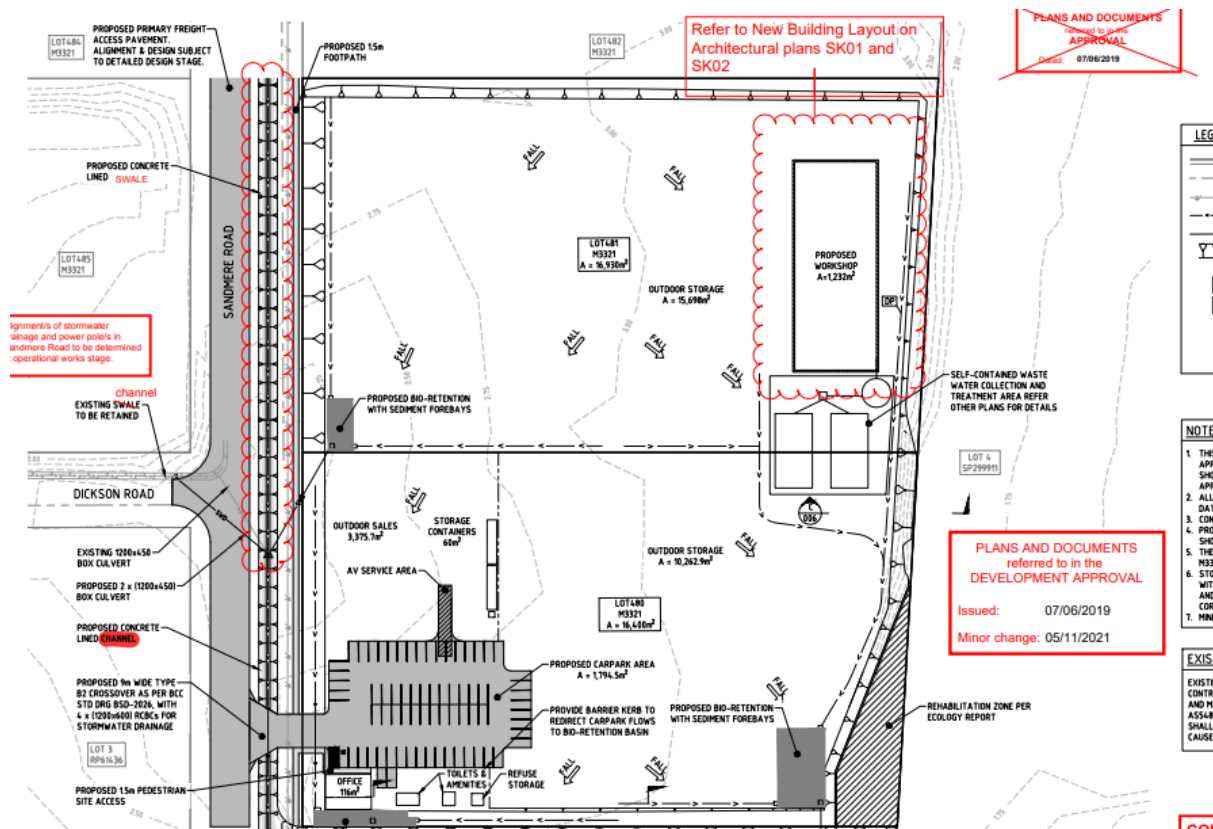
Approved Roadworks and Drainage Plan over 147 Sandmere Road, Pinkenba (Lot 481)
